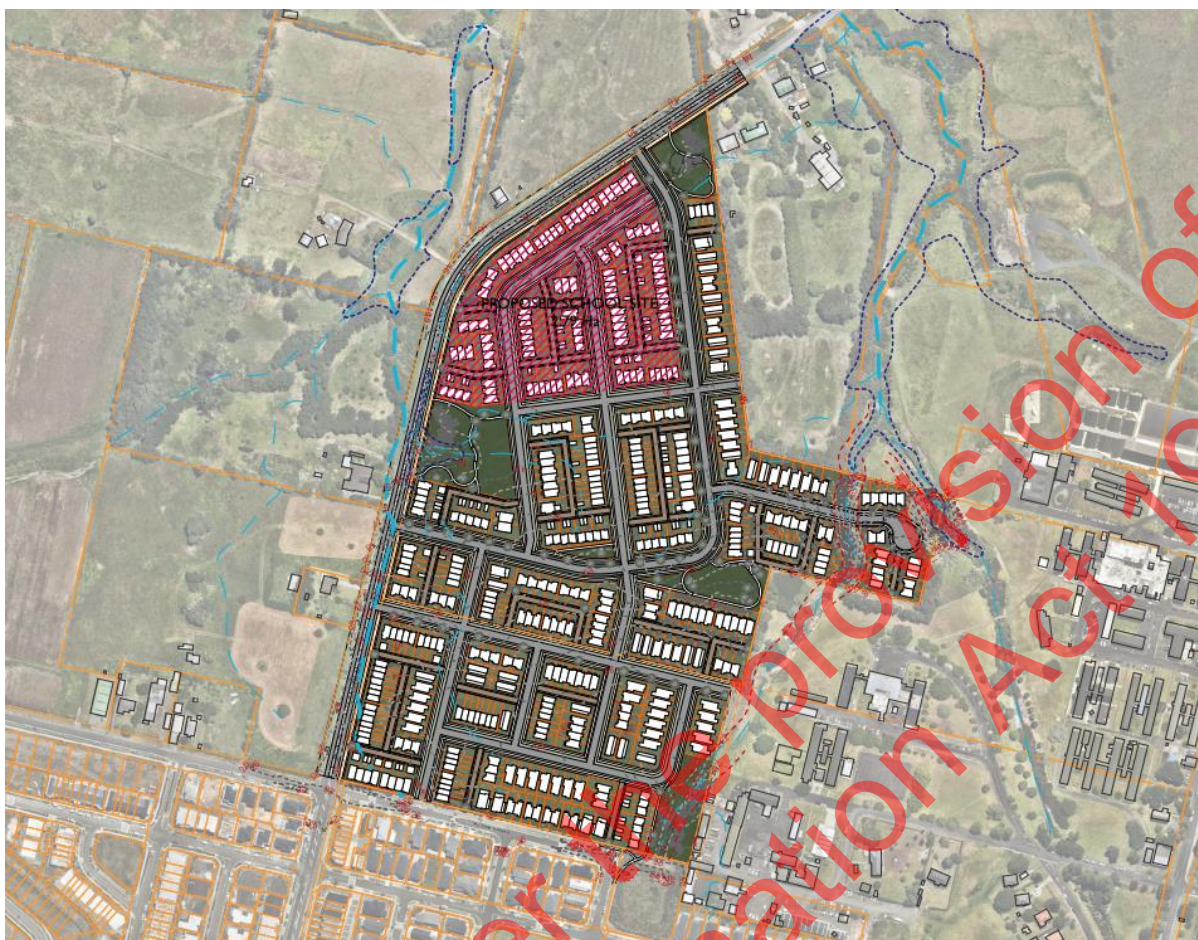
Proposed residential development masterplan at 98-100 and 102 Totara Road, Whenuapai, Auckland
